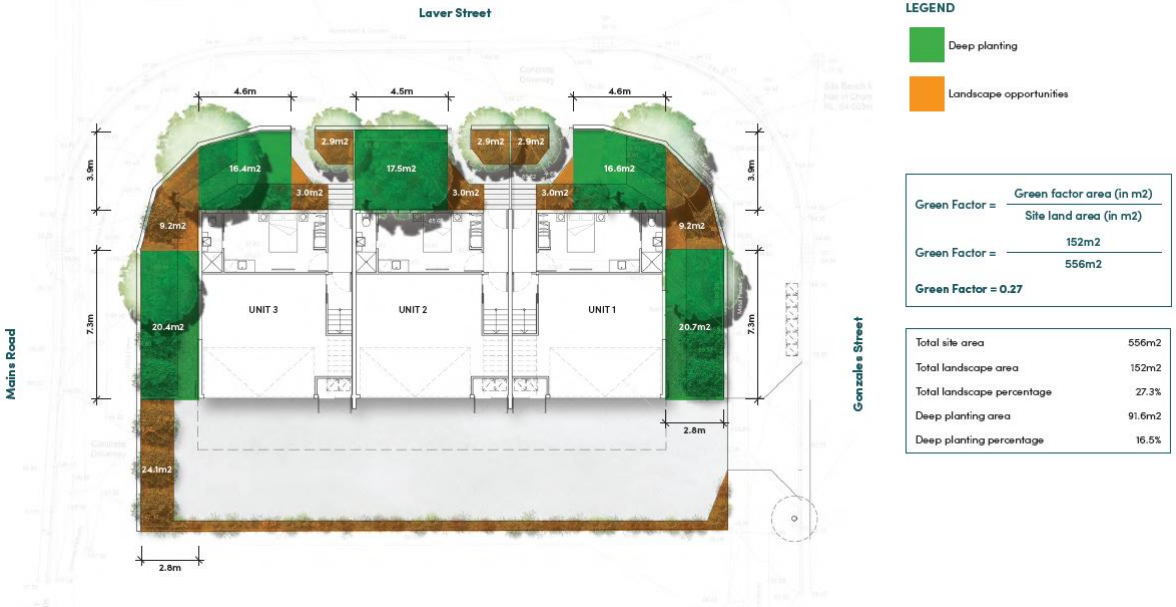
Landscape Concept Plan – Deep Planting and Landscape Areas
